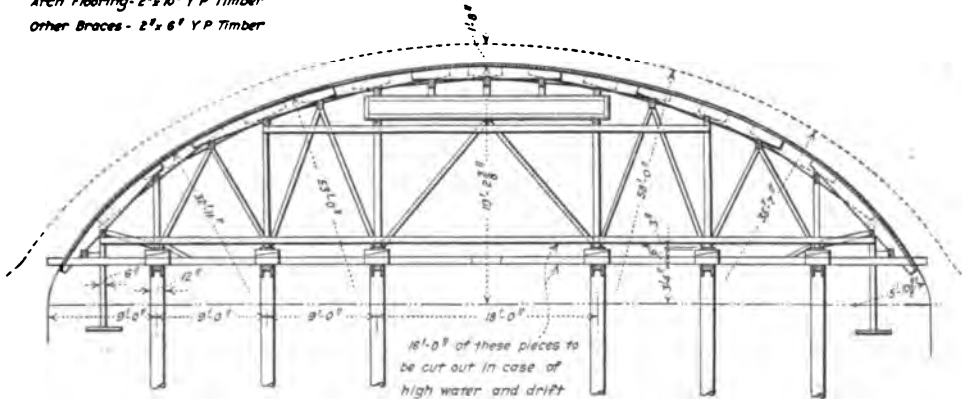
Falsework and centering for Cleveland Avenue bridge, Kansas City, Mo. Note structural steel girder carrying the center of the span to allow for flood.
